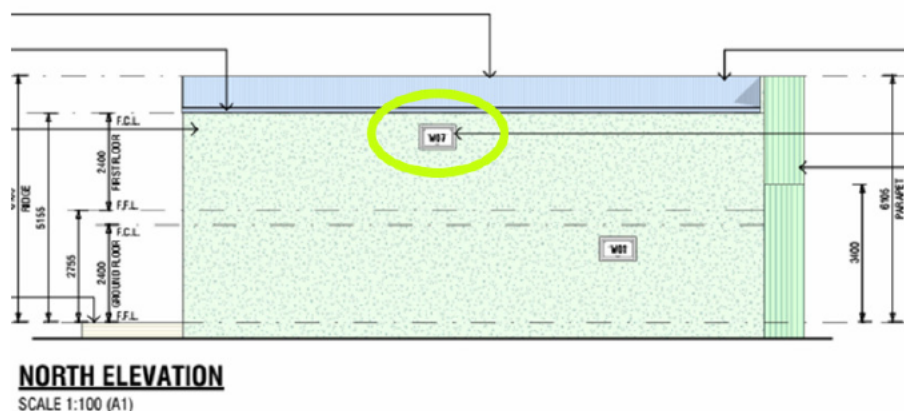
Northern Elevation. Windows on the first floor adjoining neighbouring properties circled in neon green. Window No. W07 located at the landing.
